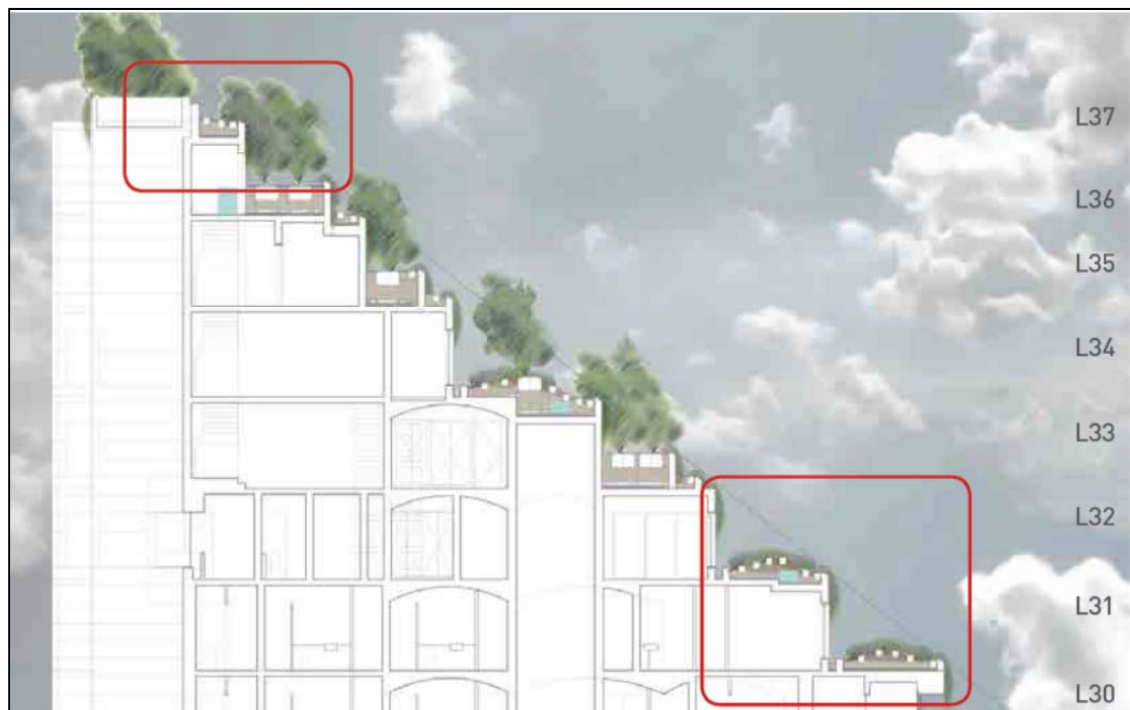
A sectional drawing illustrating the stepped roof-top terraces from Levels 30 to 37, inclusive, of the tower
